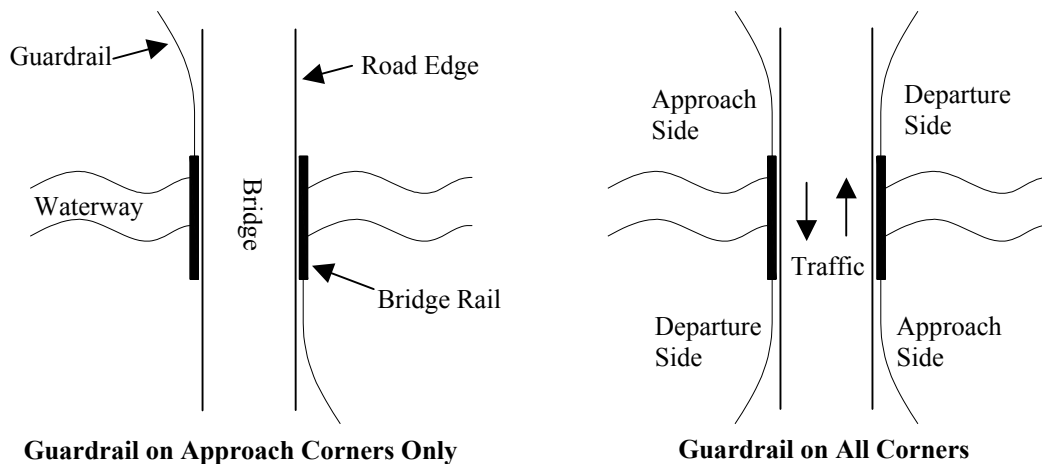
Guardrail Protection at Approach Corners Only versus All Corners
